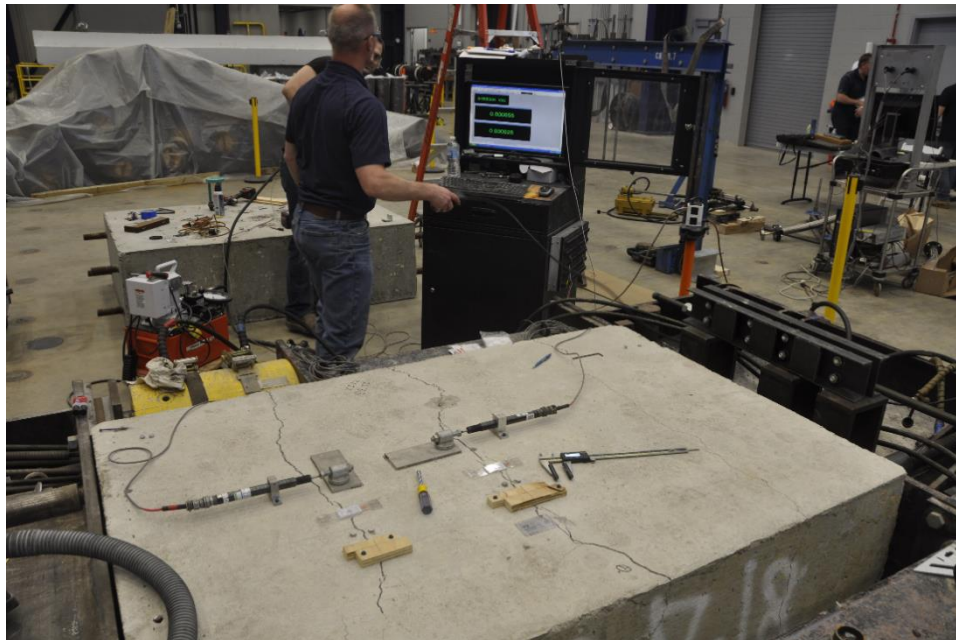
Crack induced in concrete specimen in WJE Northbrook laboratory
